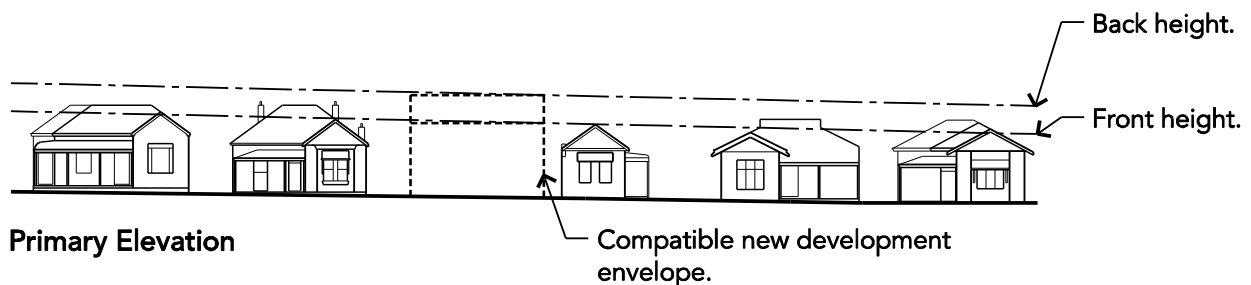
Street elevation illustration compatible roof envelopes – Griffiths Architects 2012.
